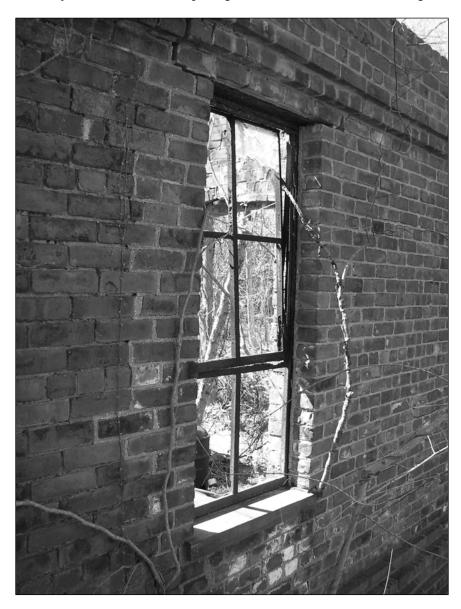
Eastern façade, detail: window opening with steel window frame, facing southwest.
